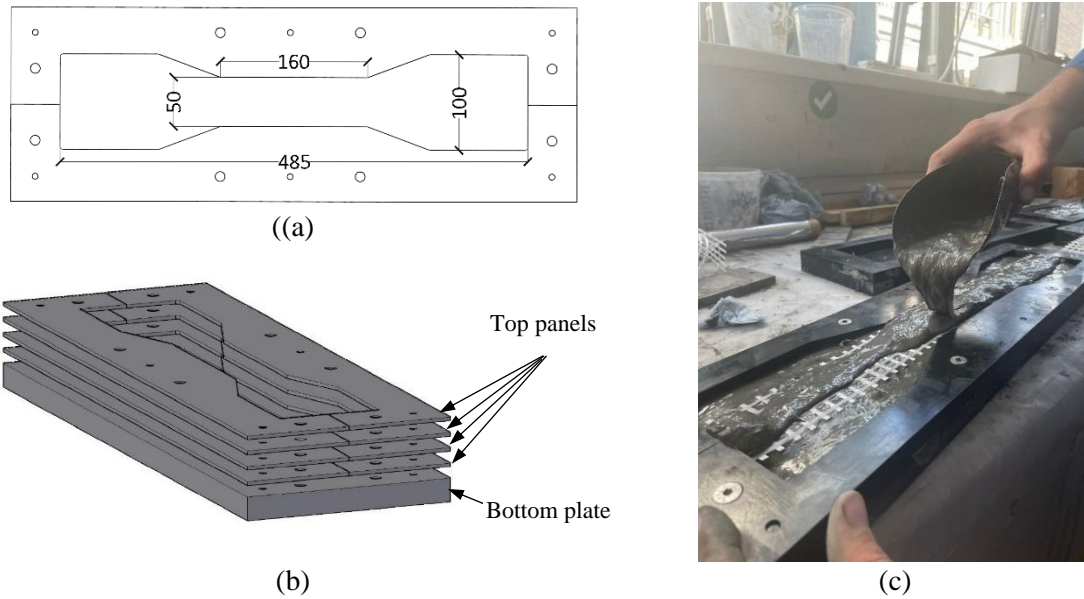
Details of mould and casting TR-SHCC specimens: (a) dimensions of mould, (b) layered configuration of mould, and (c) casting specimens according to the laminating technique.
